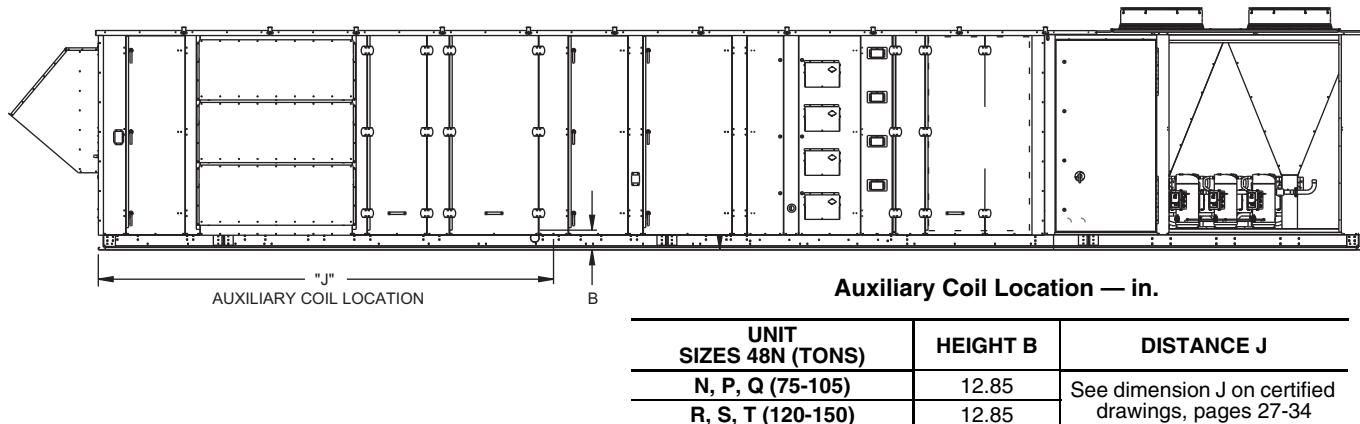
Units with Optional Extended Chassis — Location of Coil Tracks
